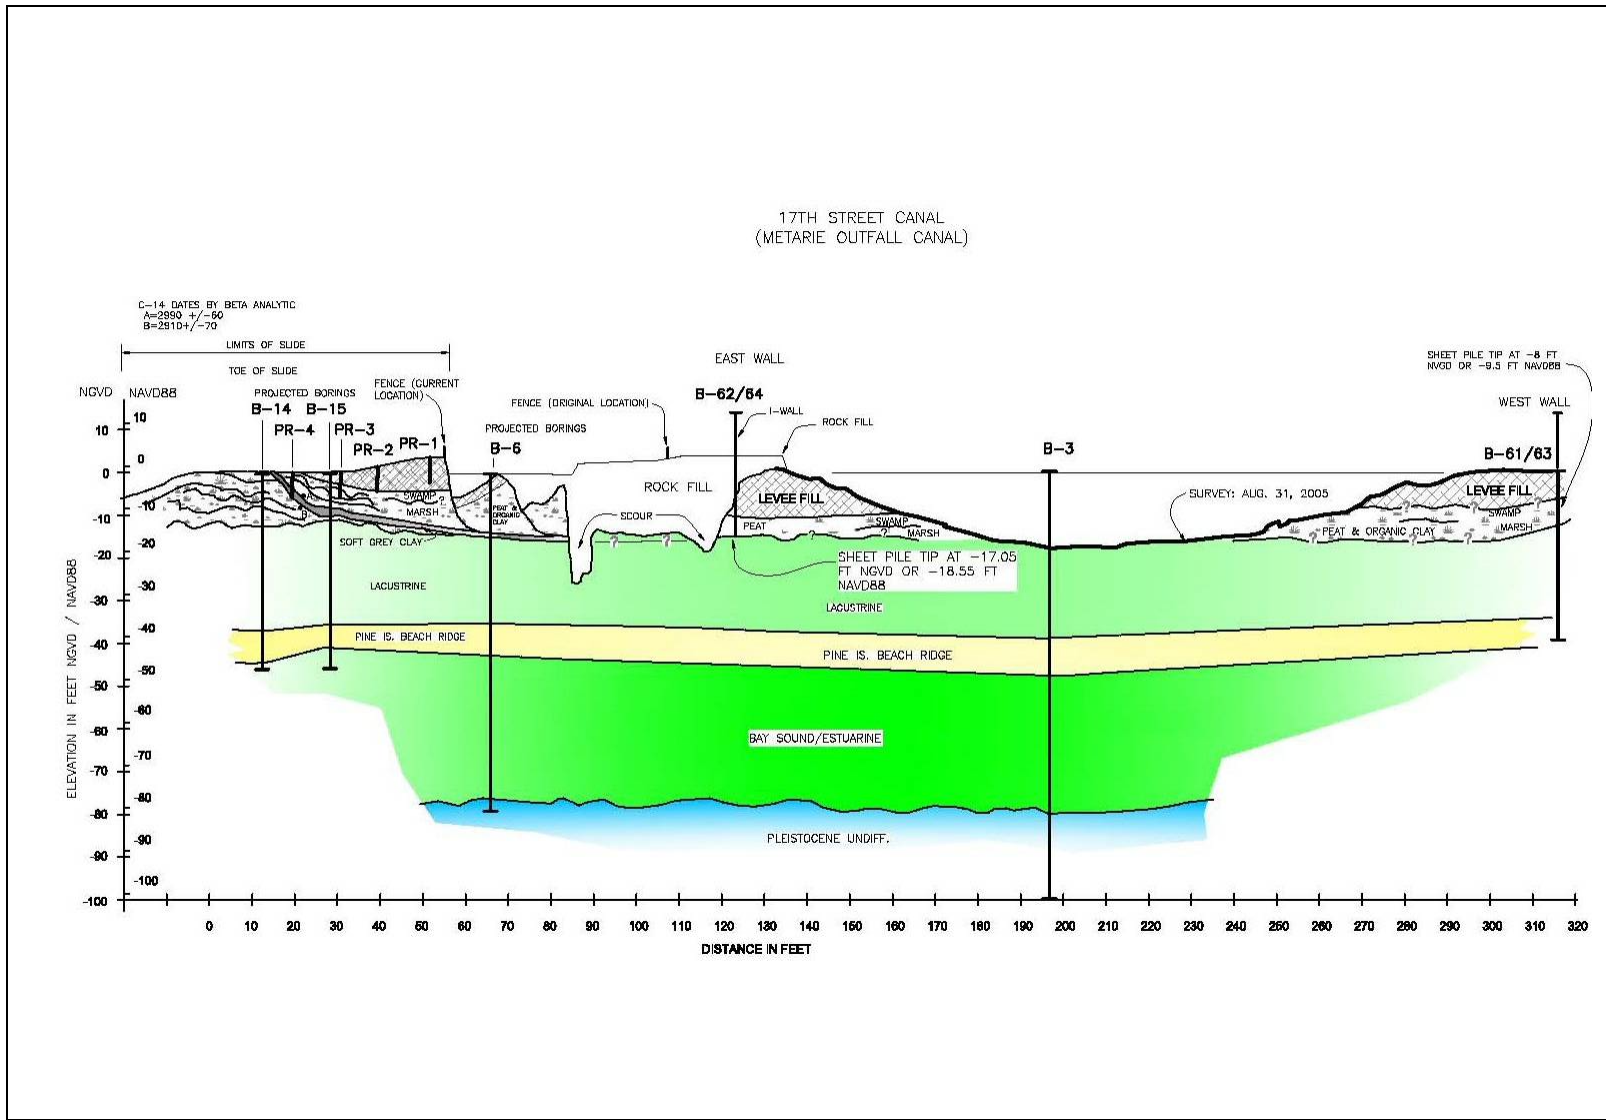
Representative cross section from 17th Street Canal levee failure. Cross-section is view looking south and shows the underlying stratigraphy, pre and post-failure engineering borings, surface topography from hydrographic and ground surveys.
